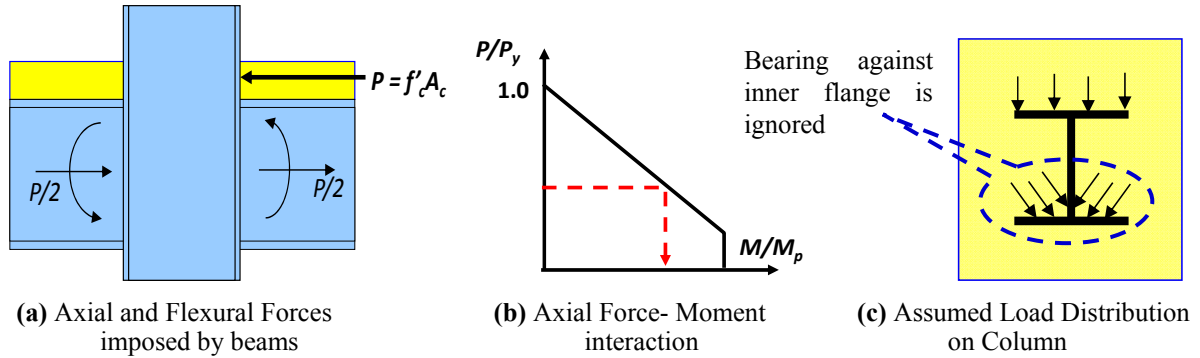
Effect of Slab Axial Force on Column Joint (MacRae et al. 2010)
